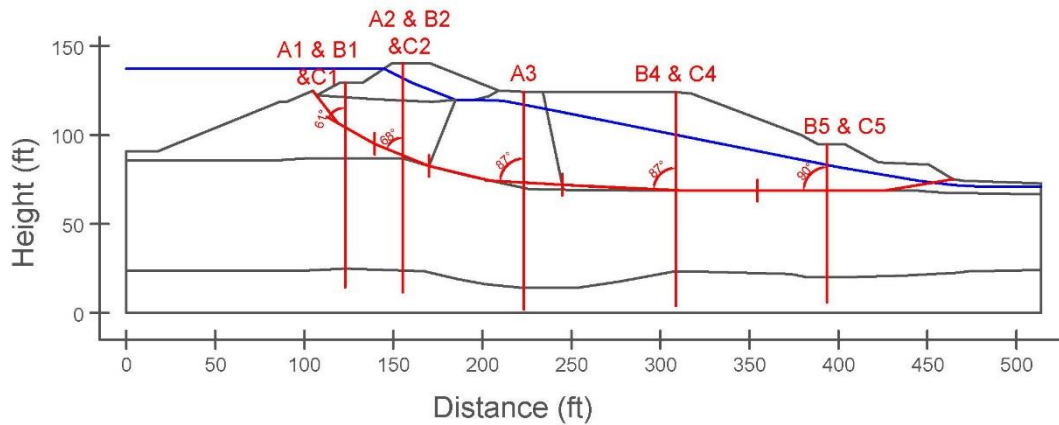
Sub-sectioning of the cross-section and failure plane for Upper San Fernando Dam
